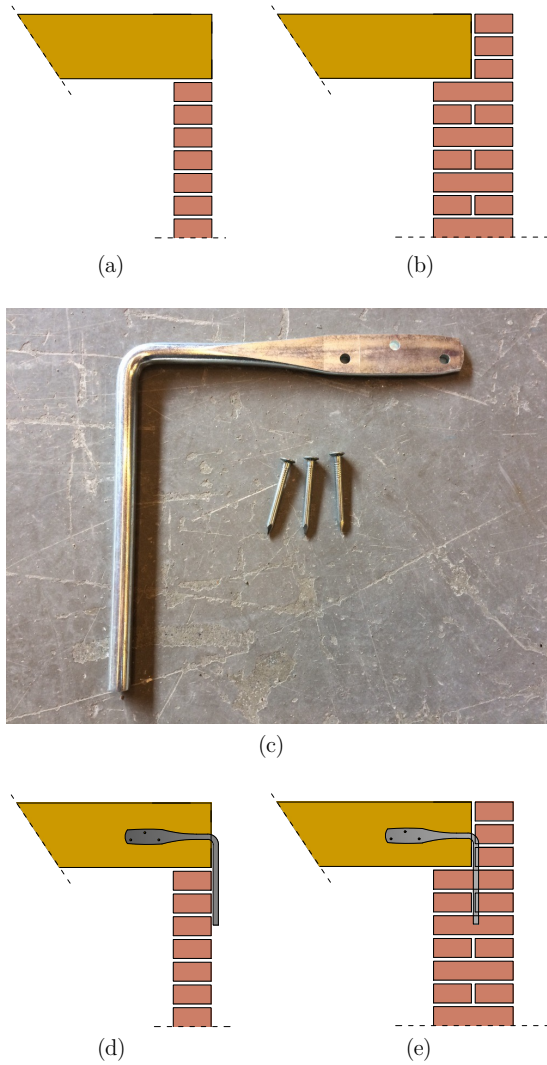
As-built timber-masonry connections typical of the Groningen area: masonry pocket in a single-leaf wall (a); masonry pocket in a double wythe wall (b); example of hook anchor (c); hook anchor in a single-leaf wall (d); hook anchor masoned in a double-wythe wall (e).
